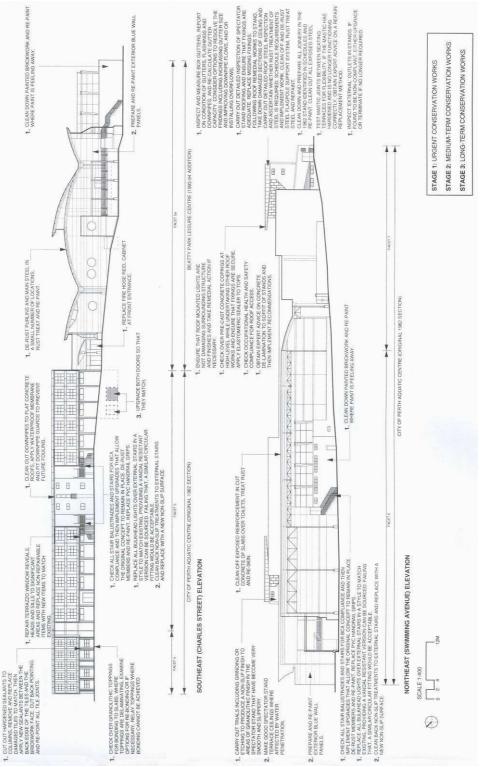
Beatty Park Leisure Centre – SE & NE Elevations (Conservation Works).
